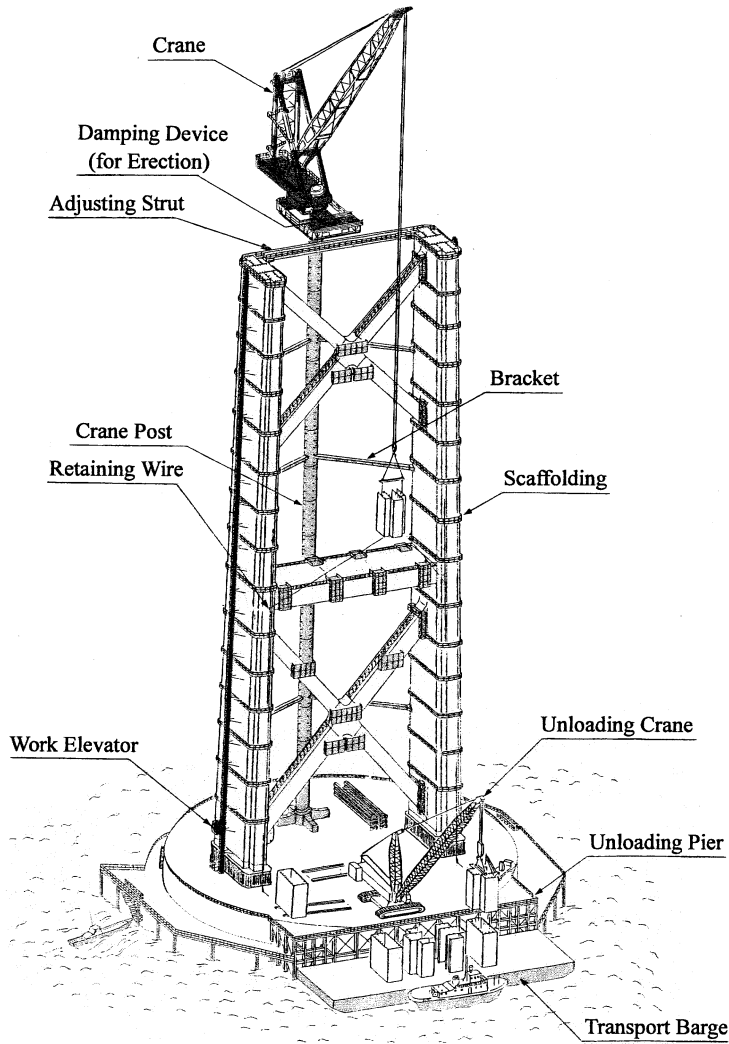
Overview of main tower construction. (Source: Honshu–Shikoku Bridge Authority, Akashi Kaikyo Bridge — Engineering Note, Japan, 1992. With permission.)
